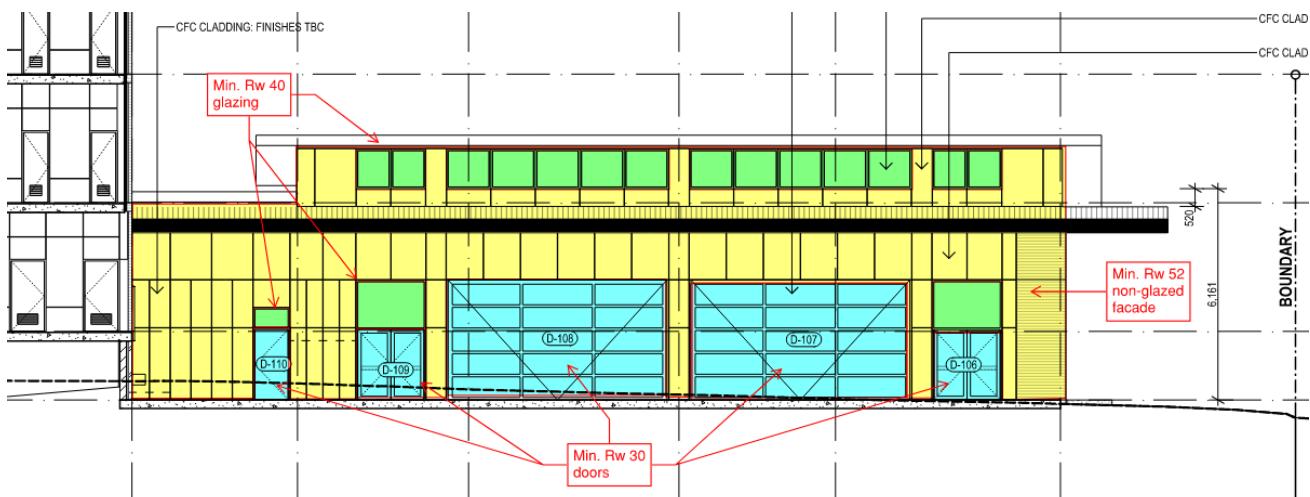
ACOUSTIC REQUIREMENTS FOR ASSEMBLY HALL FACADE PERPENDICULAR TO PRINCES HIGHWAY
